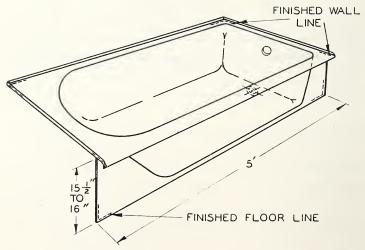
Recess single-shell bathtubs with right or left outlet. (See par. 4.3.)
